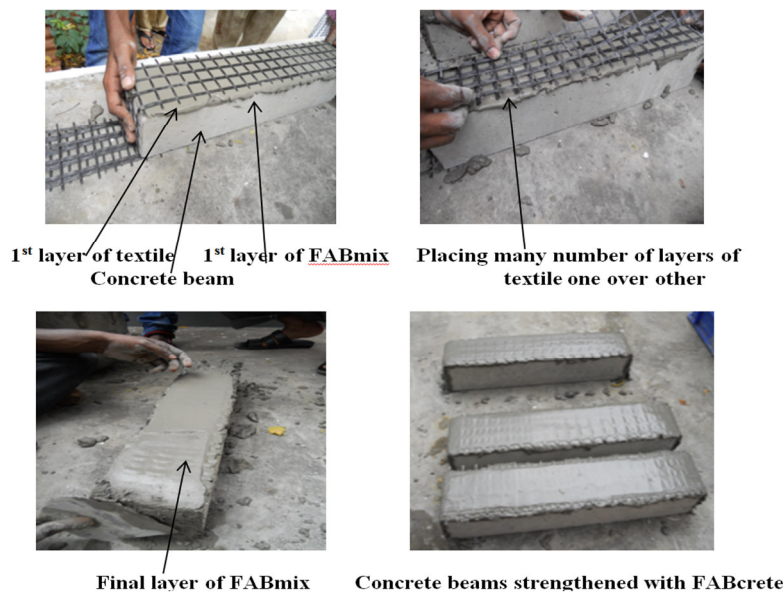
Steps followed for *FABcrete* strengthening of plain concrete beam
